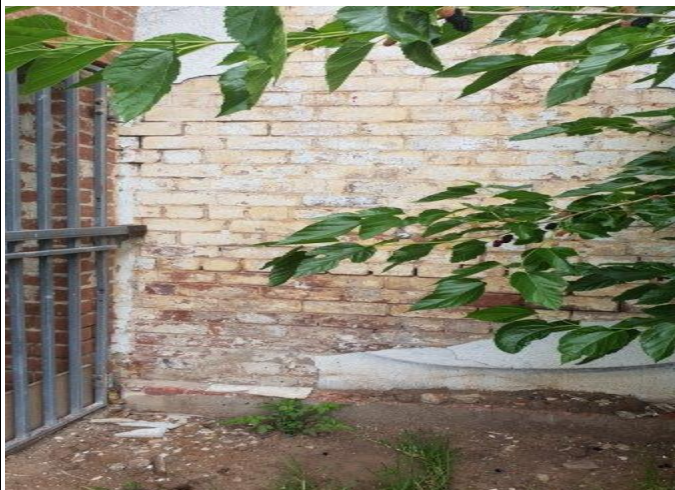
26 Good Street, Bricked walls beneath cement render façade, lead containing white paint (WSP-104452).
